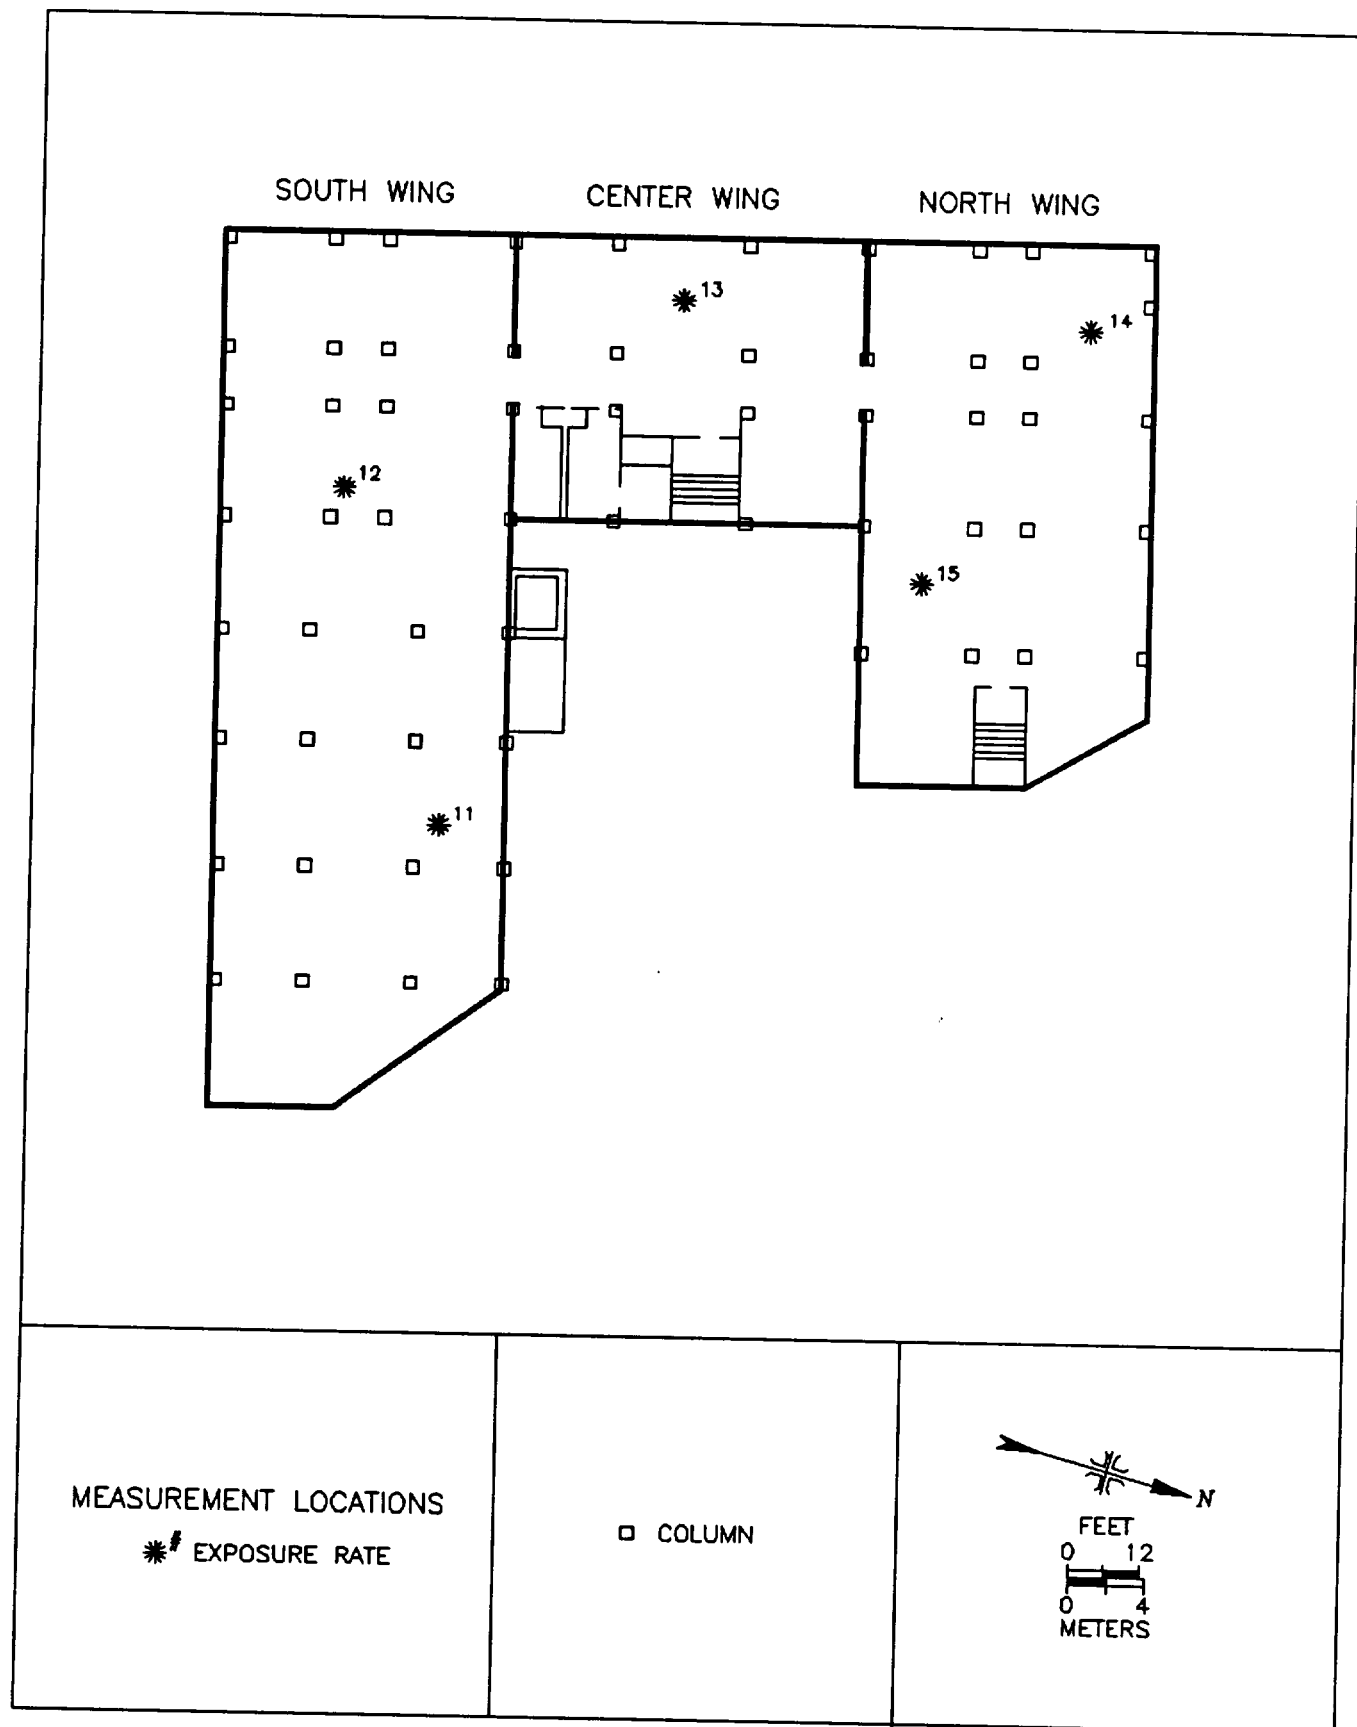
Building 7, Third Floor – Exposure Rate Measurement Locations
